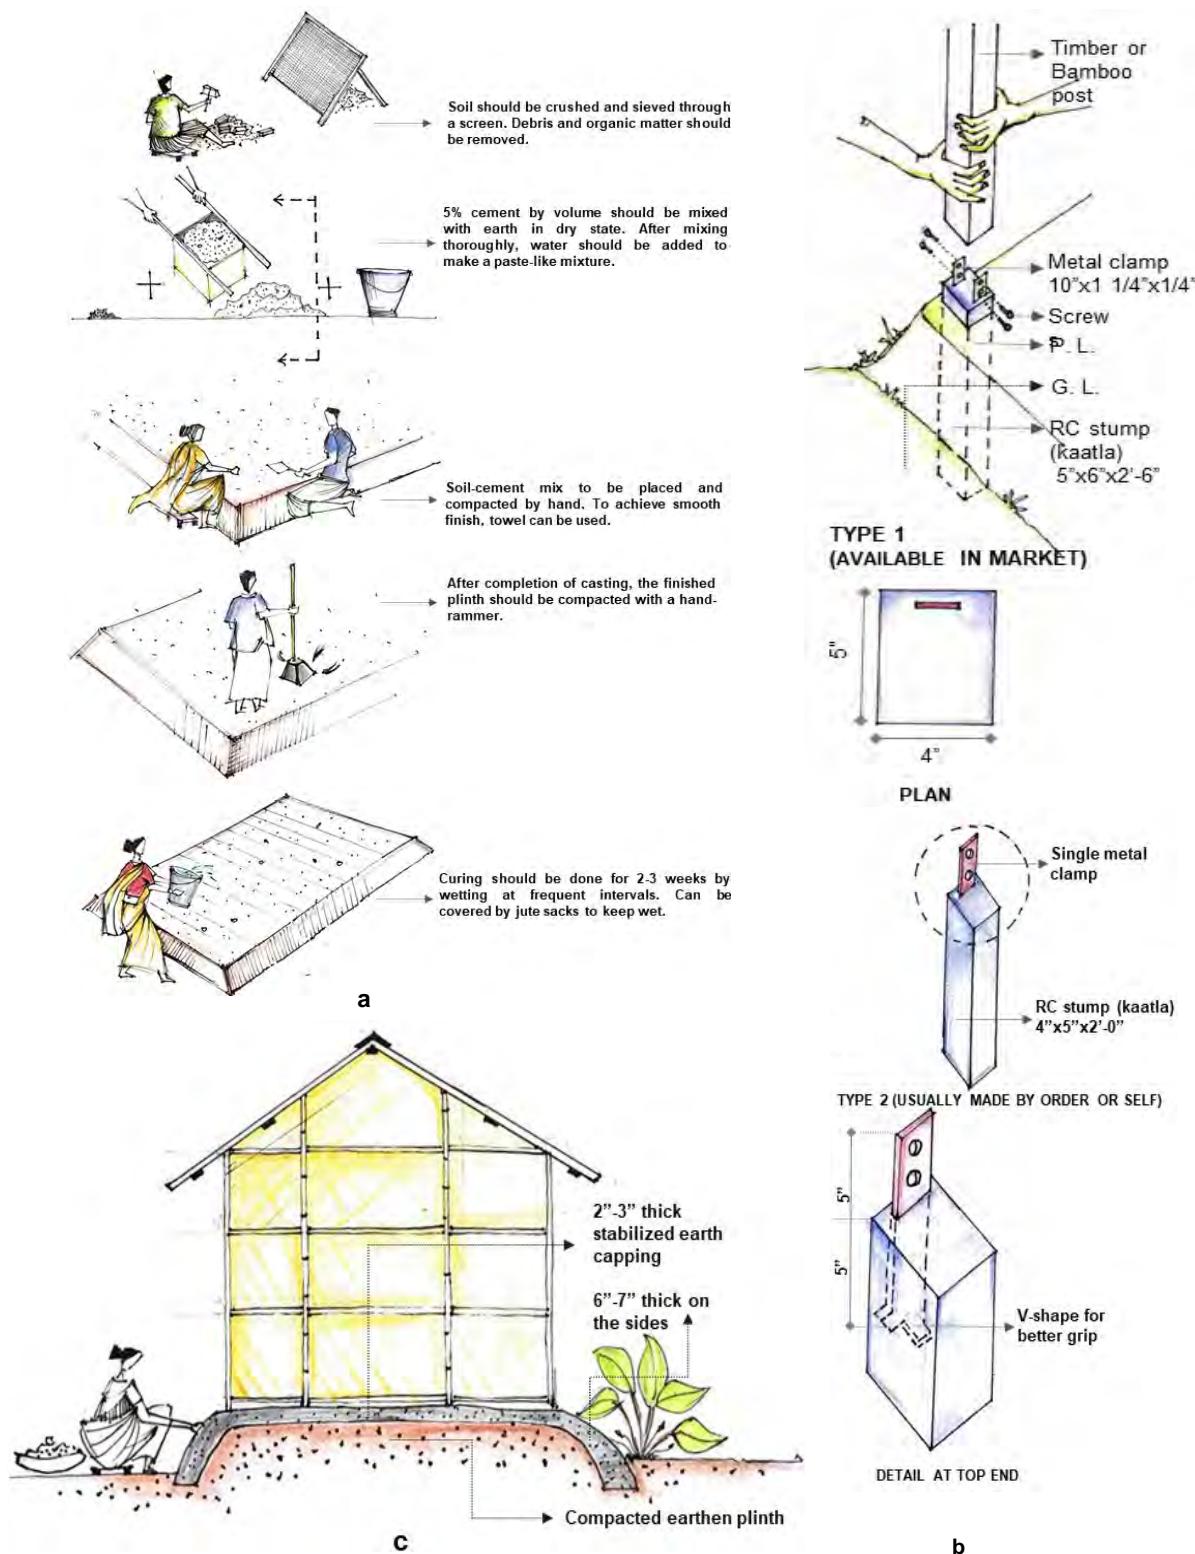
a. Cement-stabilized plinth construction process. b. Details of cement-stabilized plinth. c. Concrete stump for protecting lower end of bamboo post. (after, ADPC 2005)
